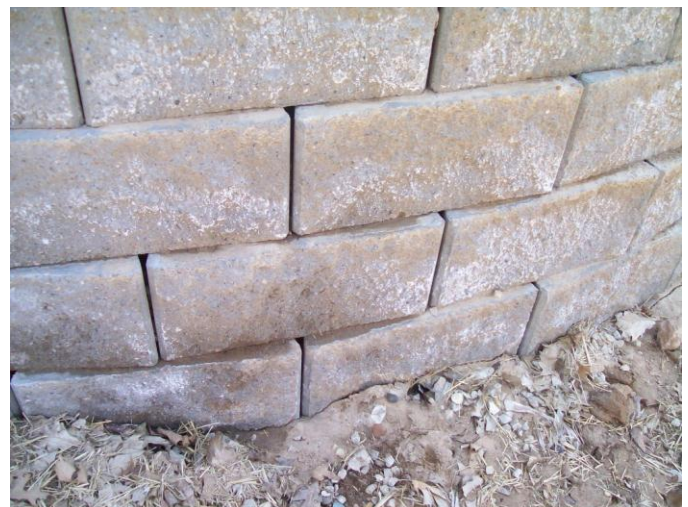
Silt and clay deposited on and below facing blocks by migration of fines out of backfill and through joints in facing.
